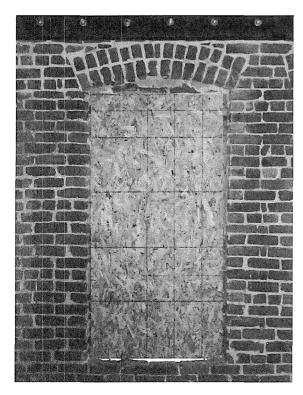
Detail view of typical punched window opening at western wall. Note arched brick lintel (photograph taken on 02/27/2018).
